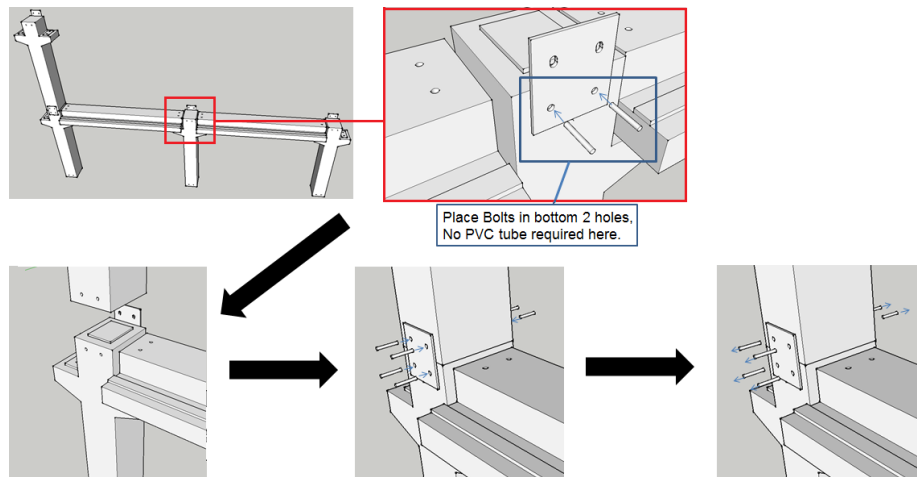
Four steps for connecting and disconnecting a column to a column using the DEMU system.
